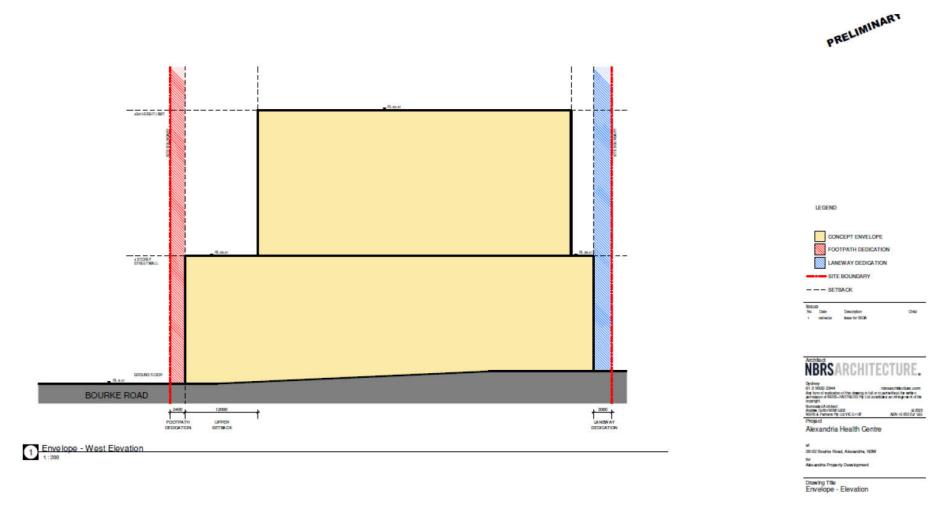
Site plan showing proposed elevations of the new development. *Source: NBRS, 2022
